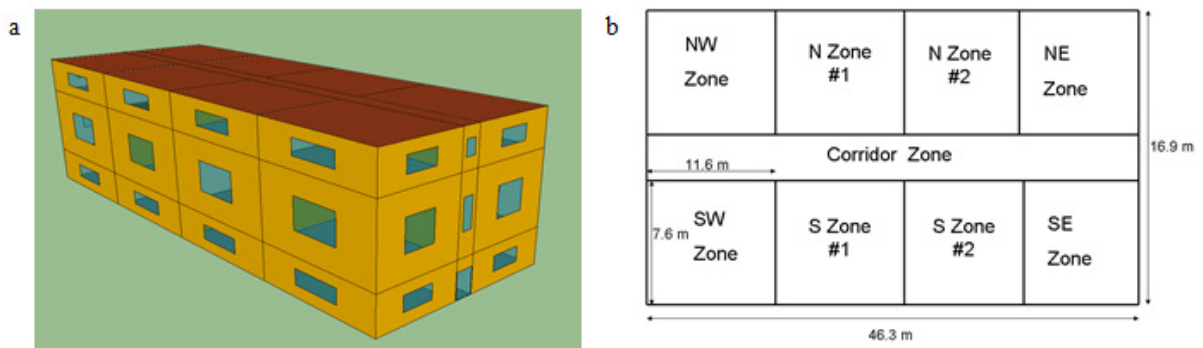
(a) 3D model; (b) Floor plan of mid-rise apartment
